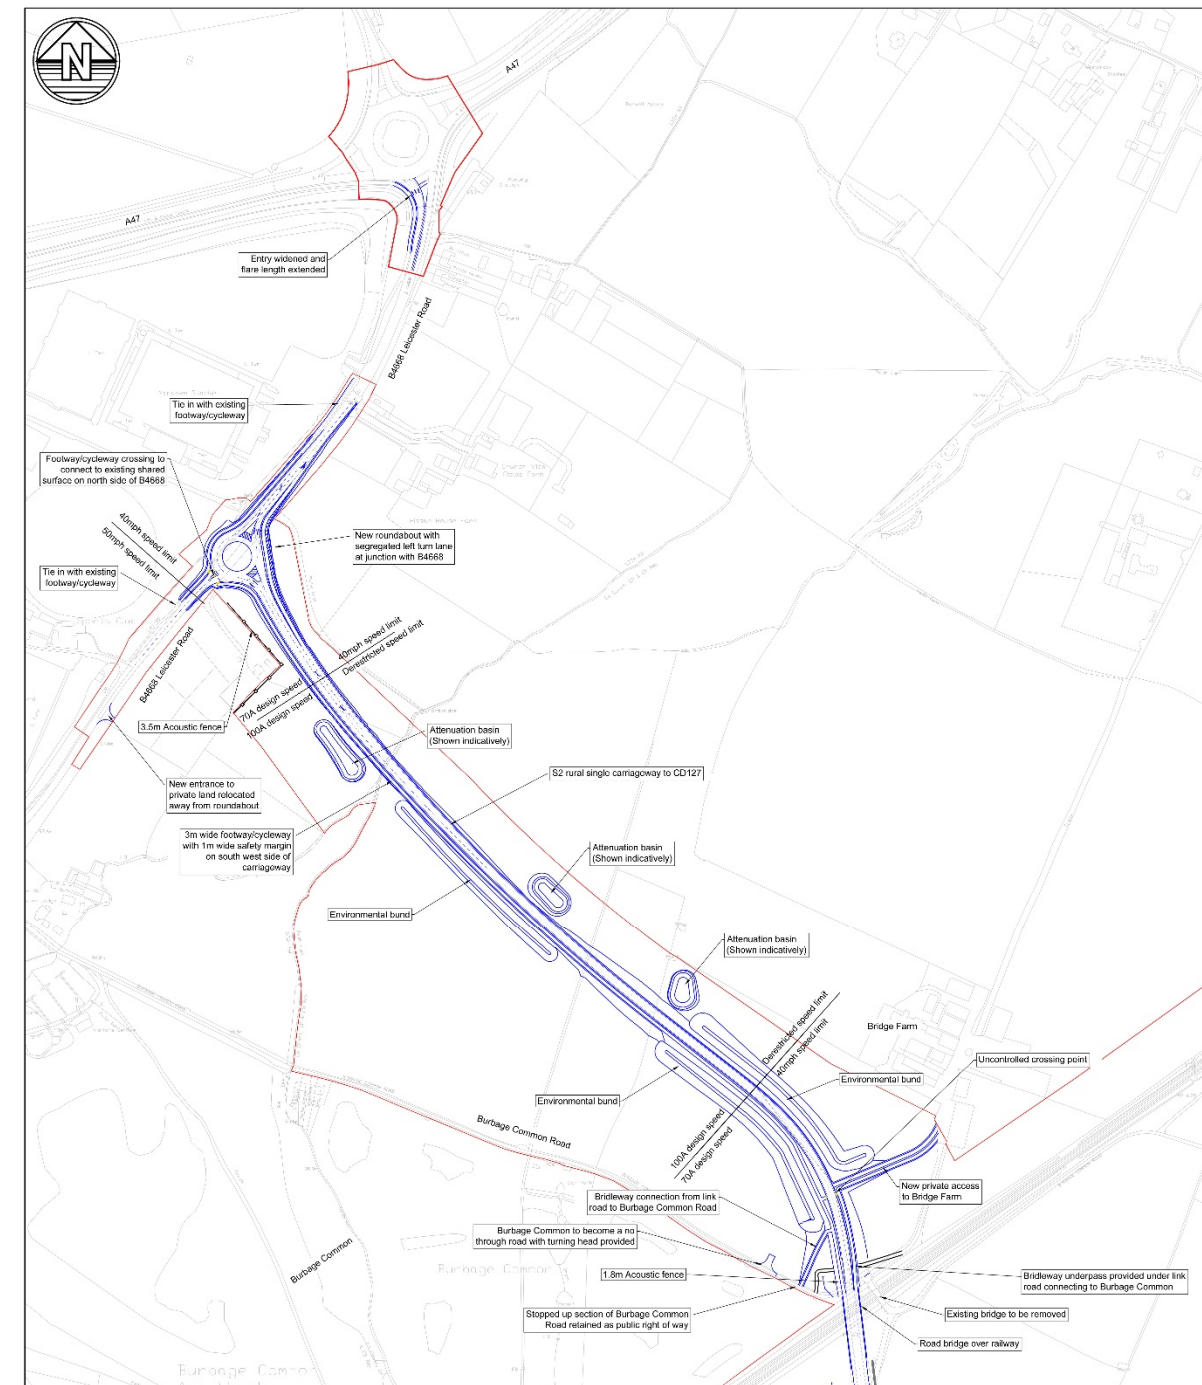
Railway Bridge Crossing, A47 Link Road and Leicester Road / A47 Connection (Document Reference 6.3.3.3)
